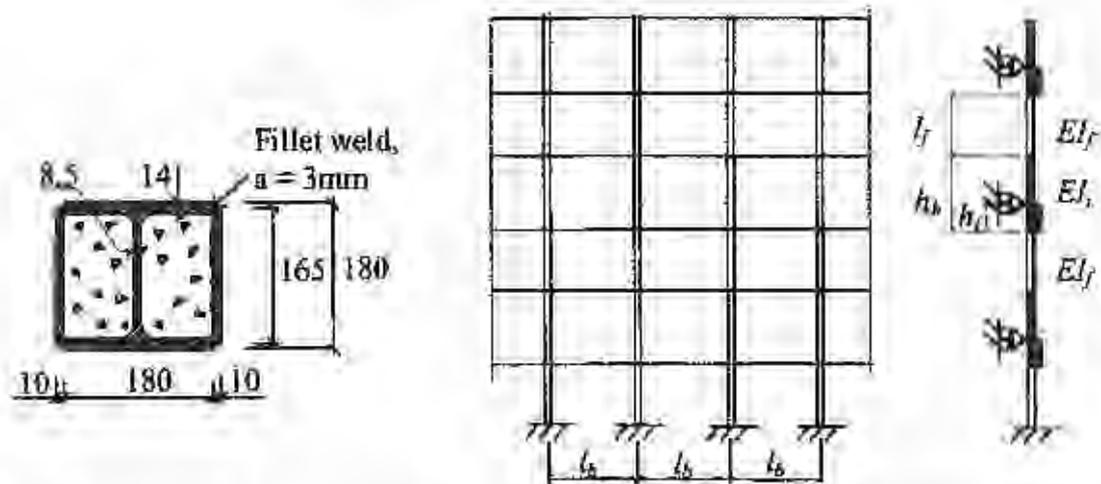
(a) Cross-section of columns; (b) Geometry and boundary of the façade columns.
